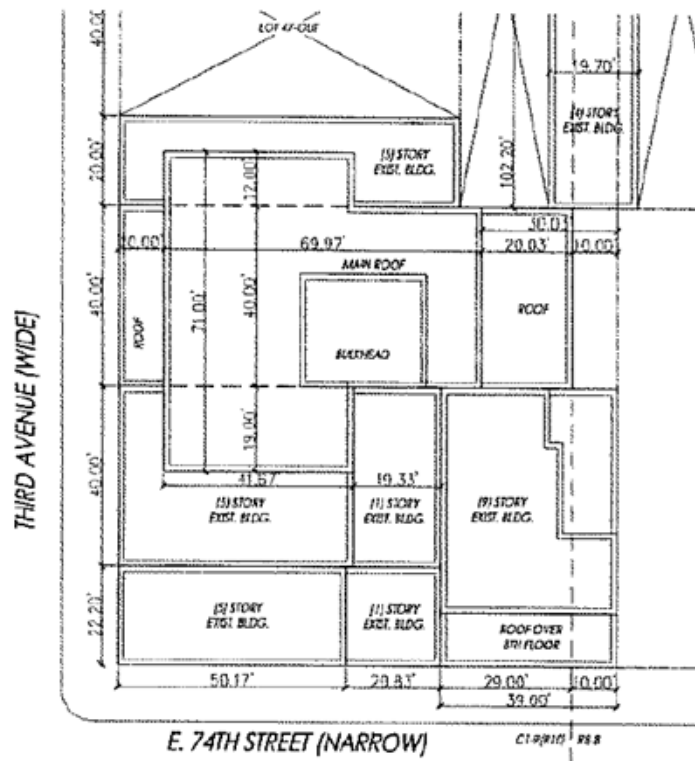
Site plan from BSA application dated July 24, 2017, page 32
